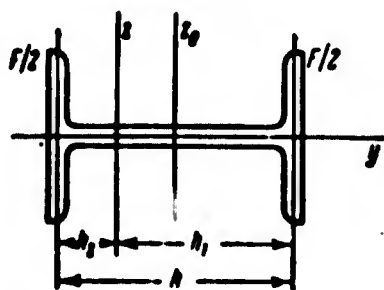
Zones of loading and unloading in case of an I-beam section.
